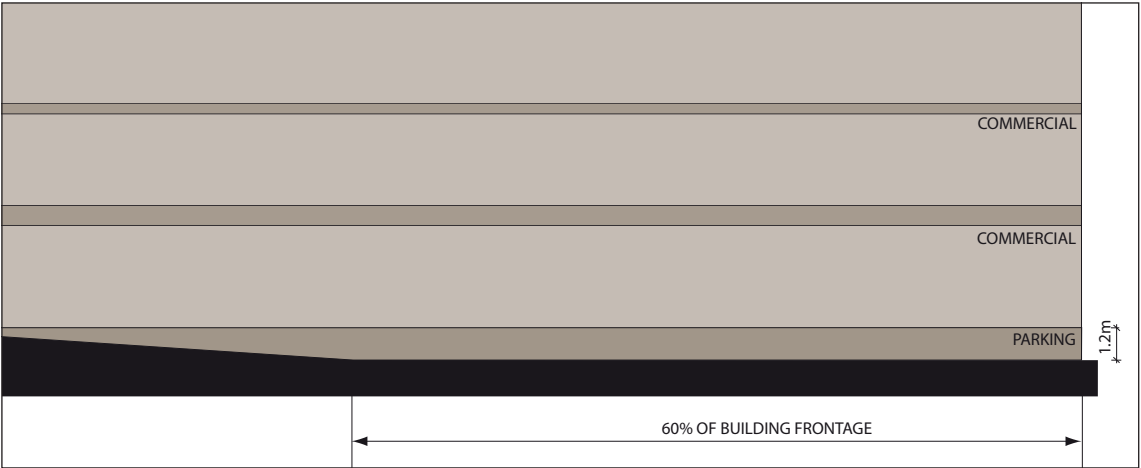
Along public streets, basement parking must protrude no more than 1.2 m above ground for no more than 60% of the building frontage
